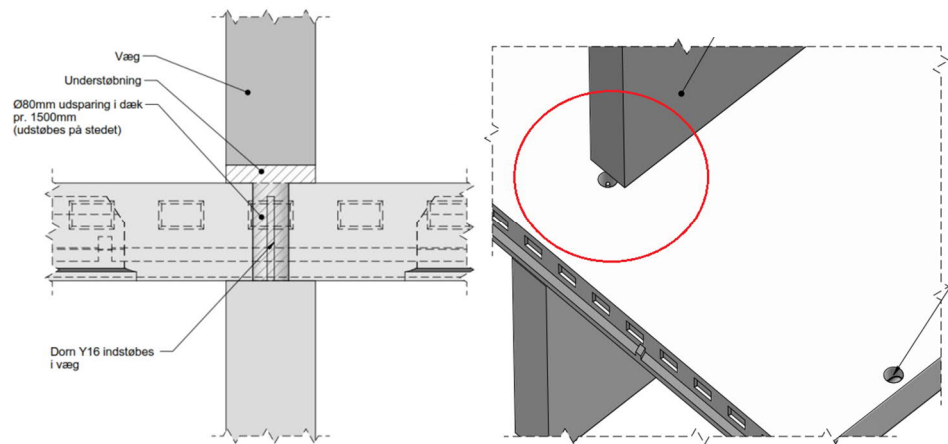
Cantilevered slab connection: detail (left); perspective view (right); (Abeo A/S, n.d.)
